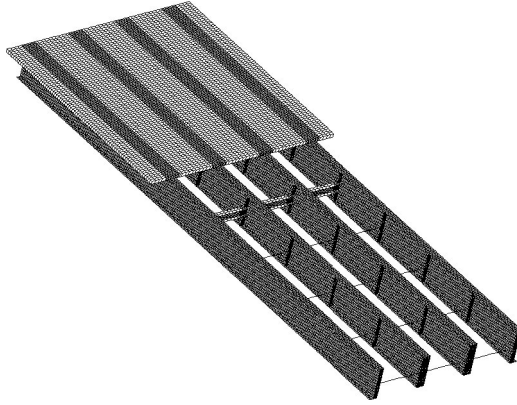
Finite element mesh of steel girder bridge with concrete slab.
